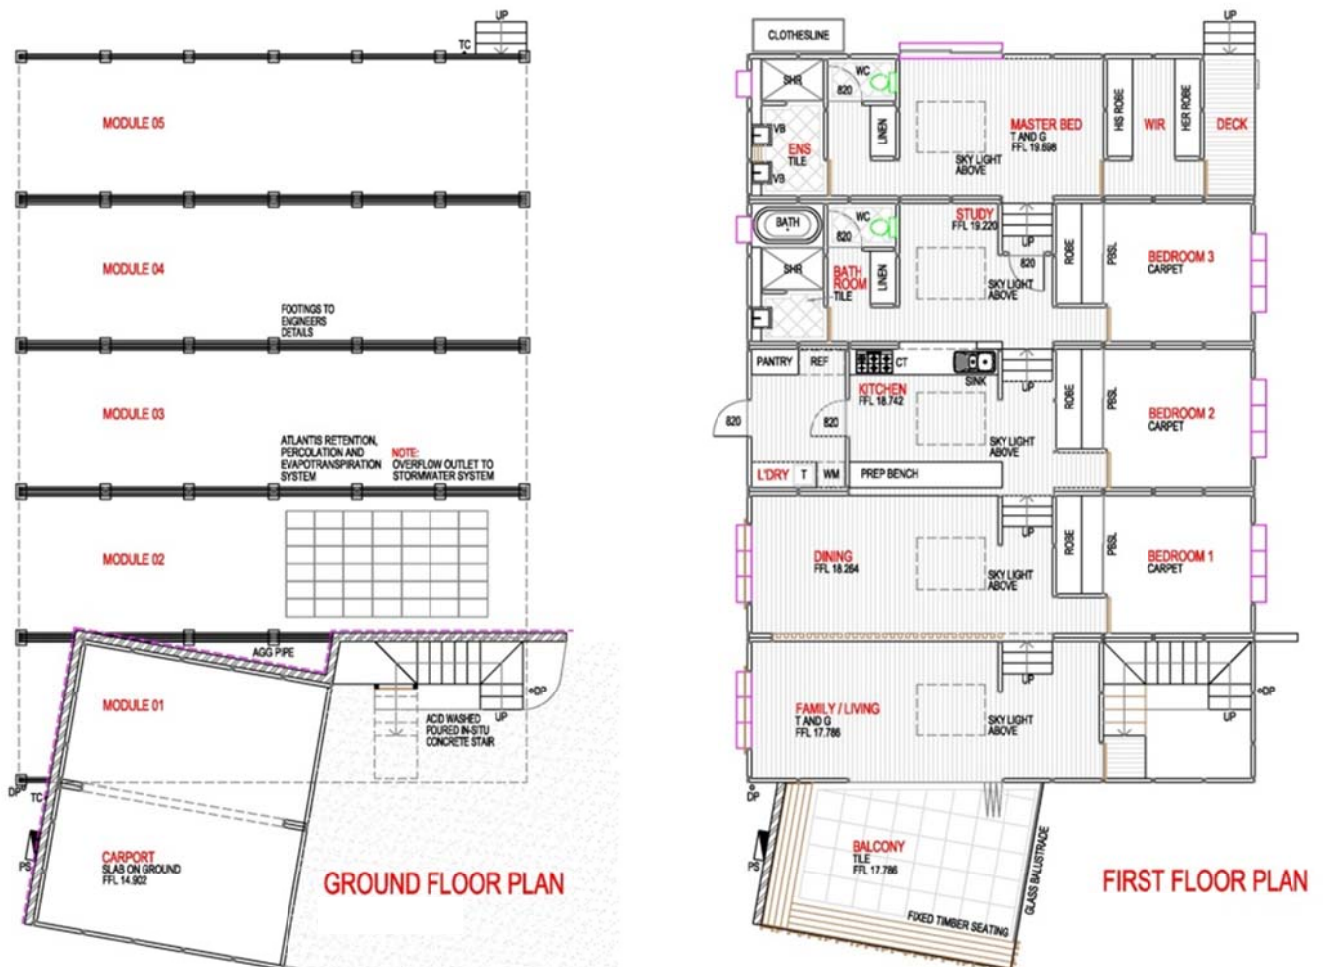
Bleuscape Design – Sloping Site House Plans
